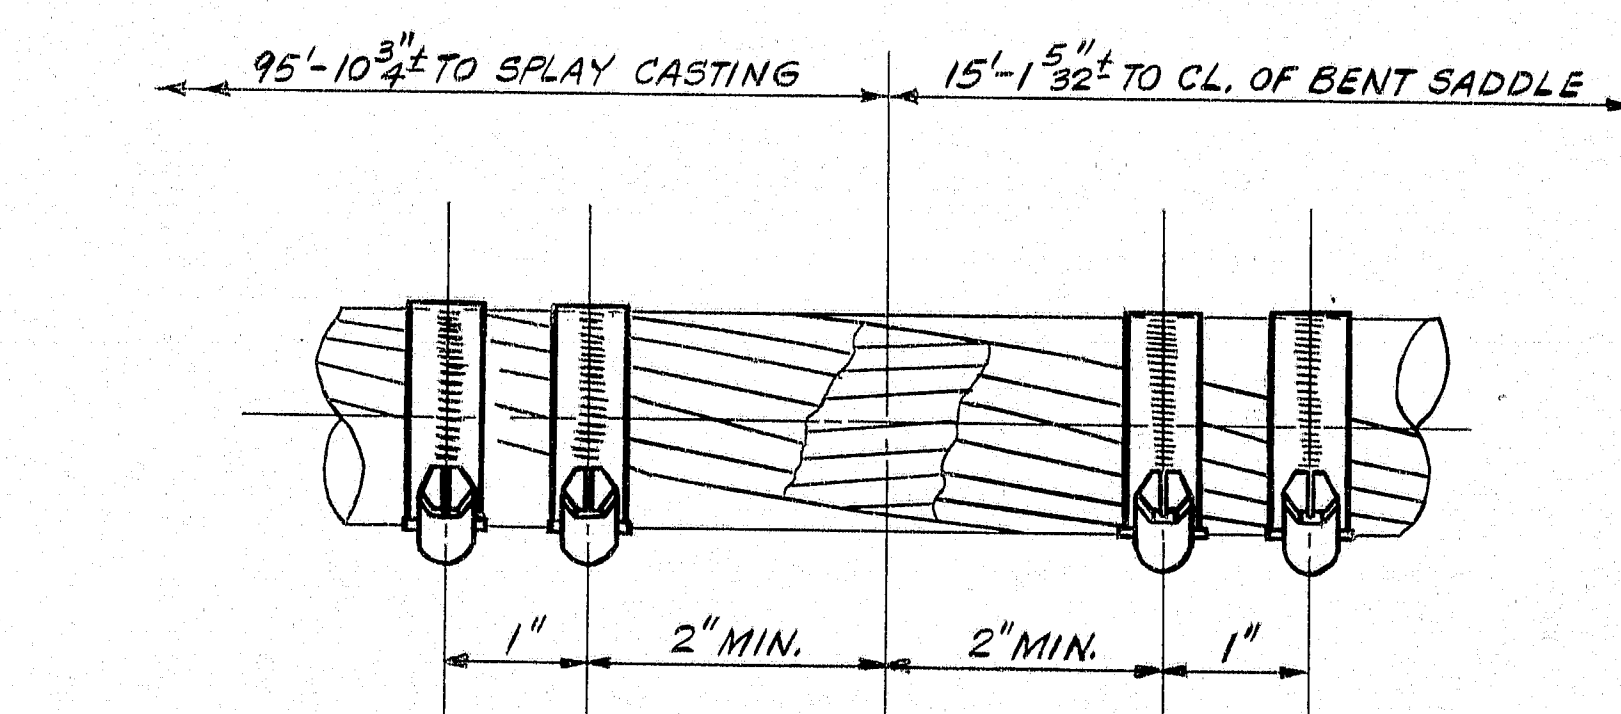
TYP. REPAIR OF MAIN CABLE STRAND NO. 17
